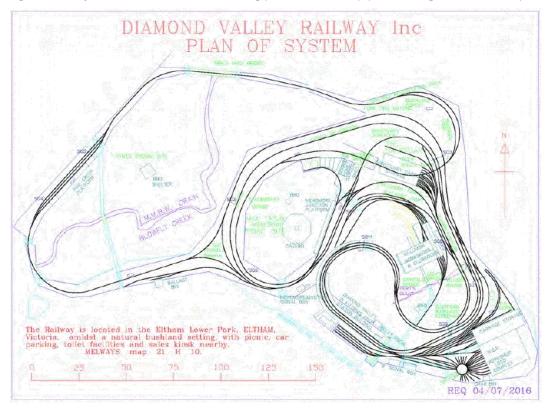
Track plan of the Diamond Valley Railway in 2016. (Source: Diamond Valley Railway)
